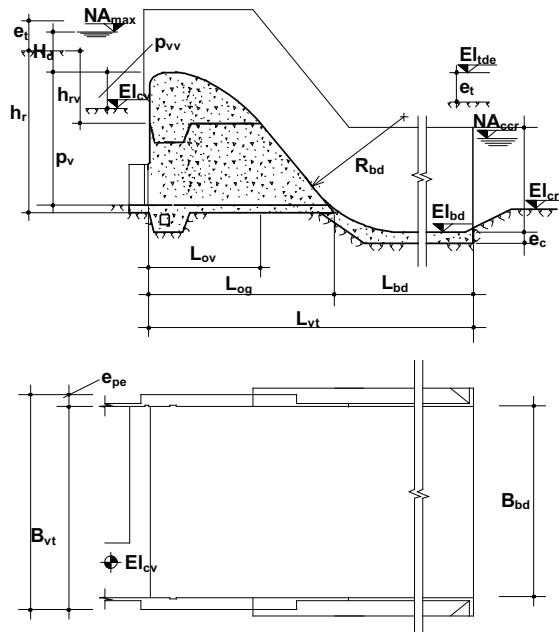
Typical cross-section and plan of an ungated surface spillway with a high ogee crest and a stilling basin.
